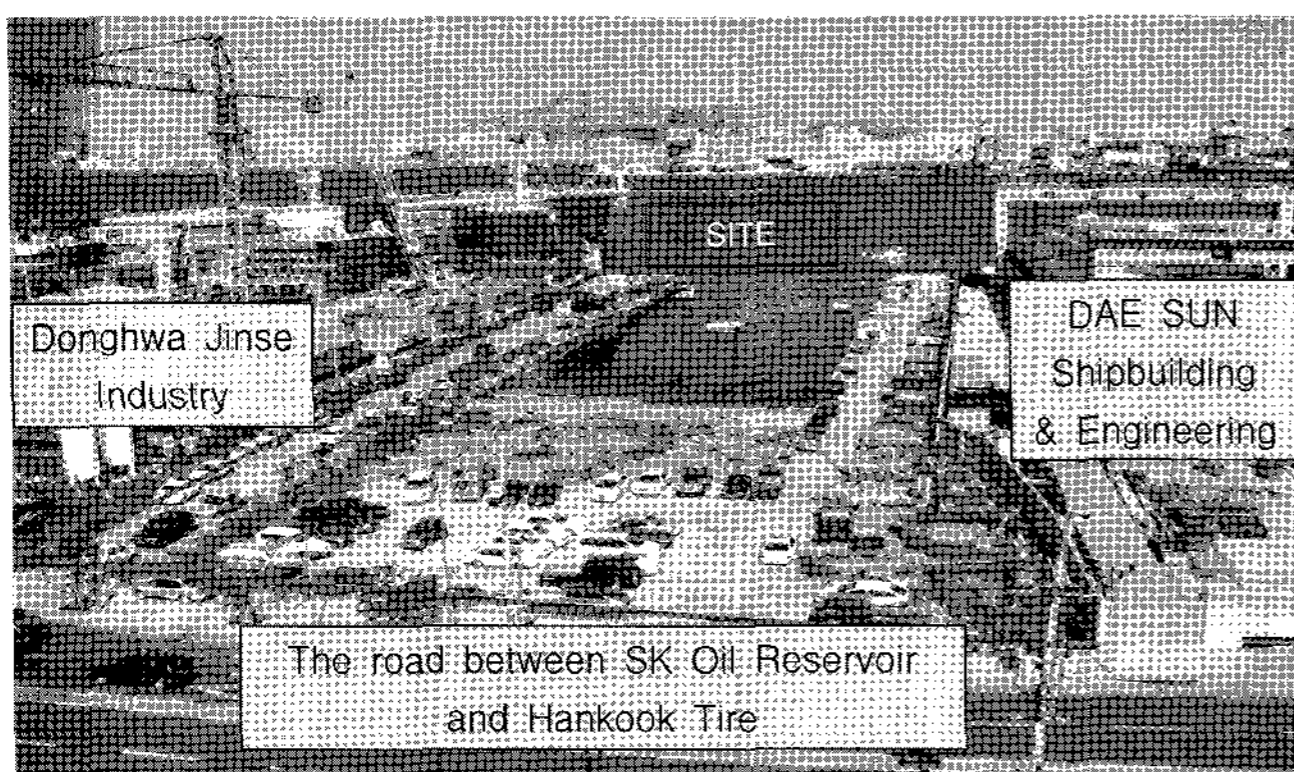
Bird's eye view of the site after waterfront construction began (May 2008)
